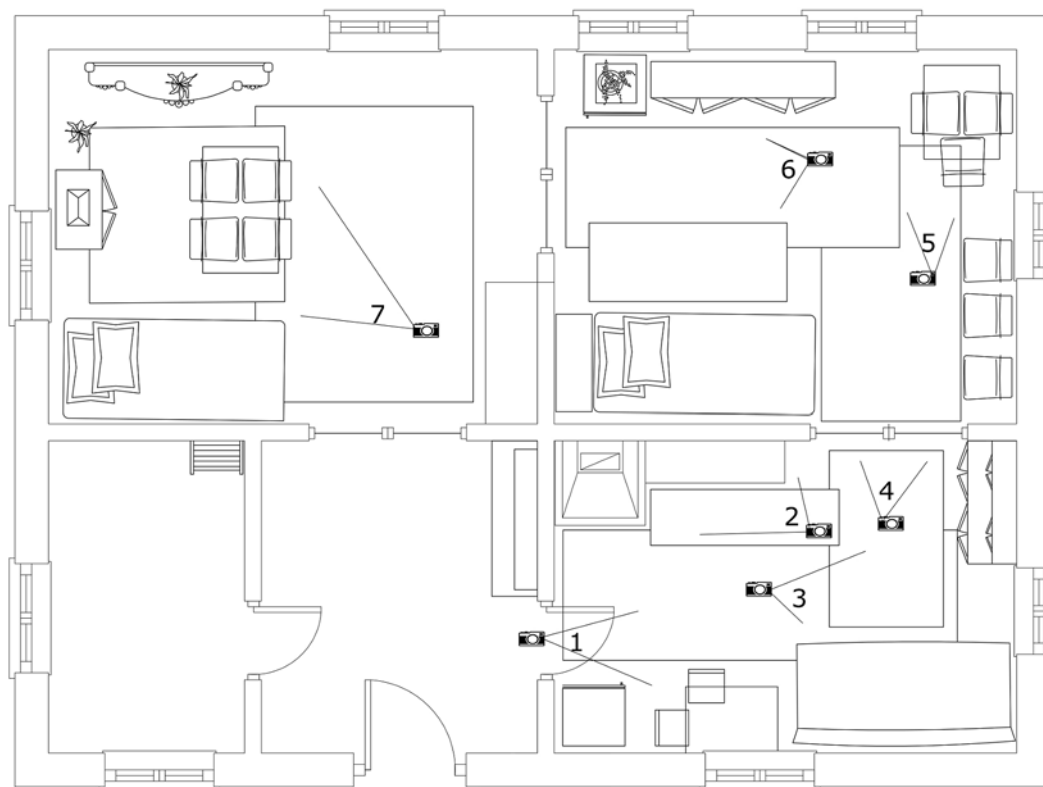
The first of the three surveyed houses in Nowa Wola, Michałowo commune – ground plan with photo viewpoints
